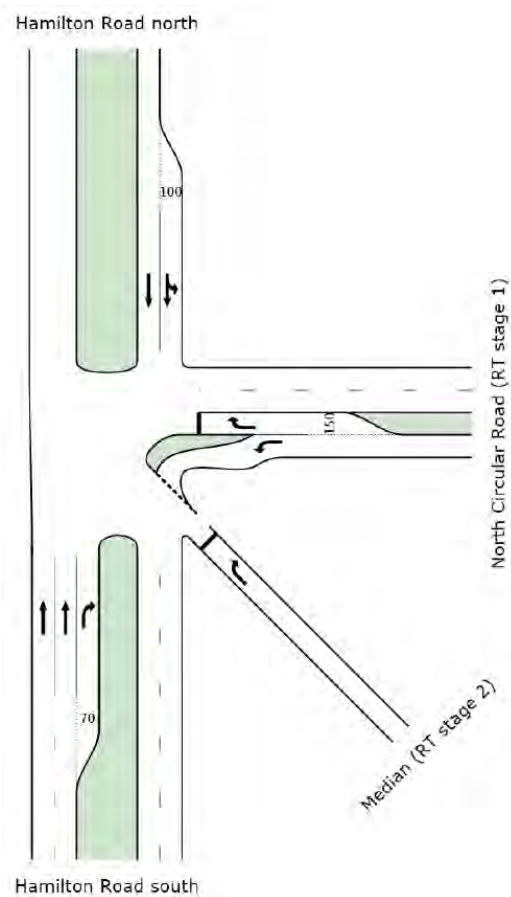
SIDRA intersection layout (North Circular Road and Hamilton Road)
